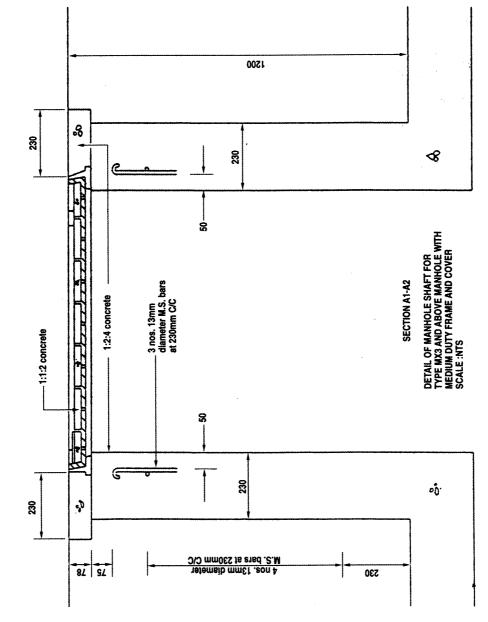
MANHOLE DRAWINGS - TYPE MX3 & ABOVE
